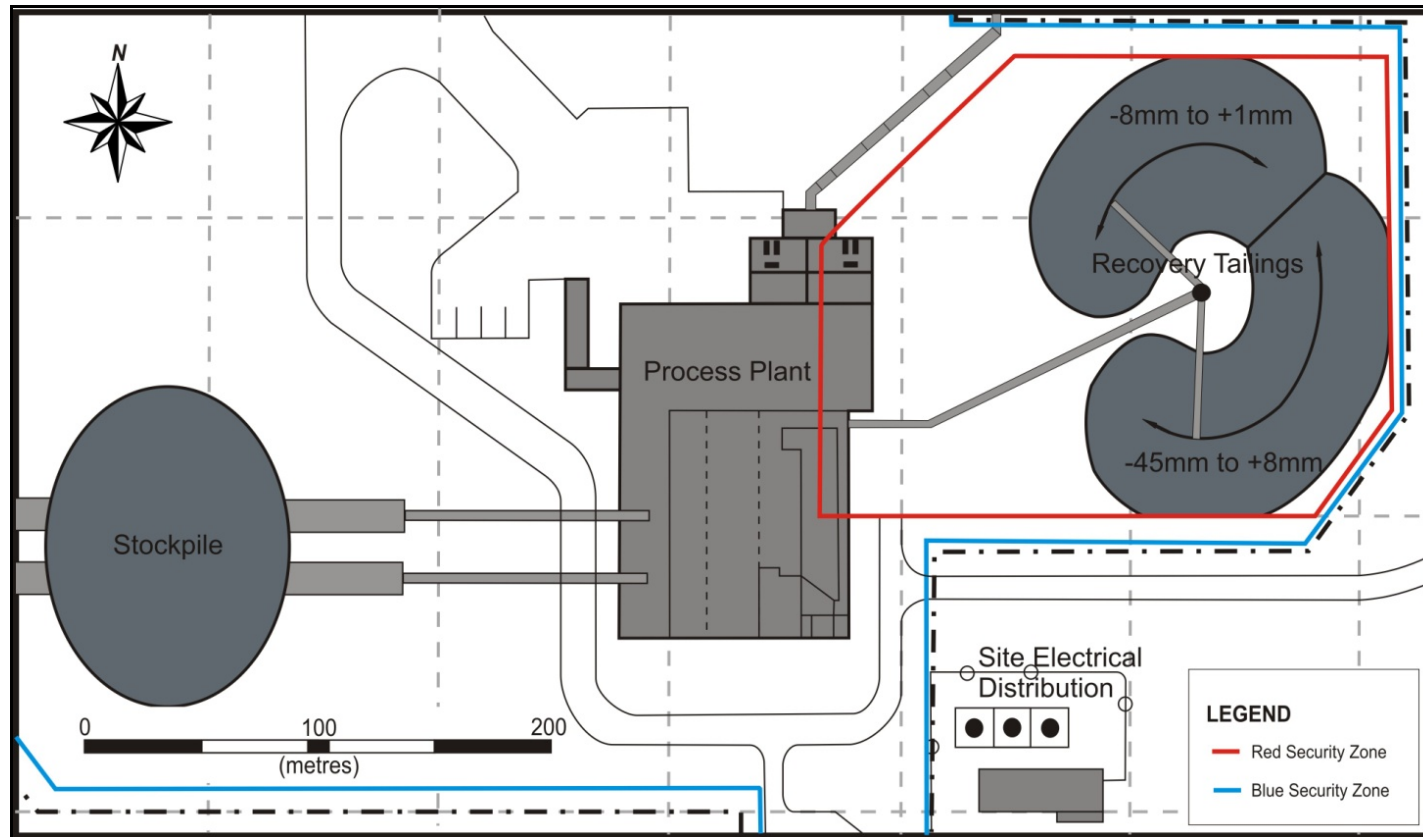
Proposed Layout of the Process Plant, Stockpile and Recovery Tailings Stockpile
